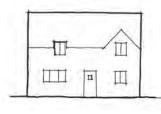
Building scale does not rely on size but rather the architectural treatment of a façade
